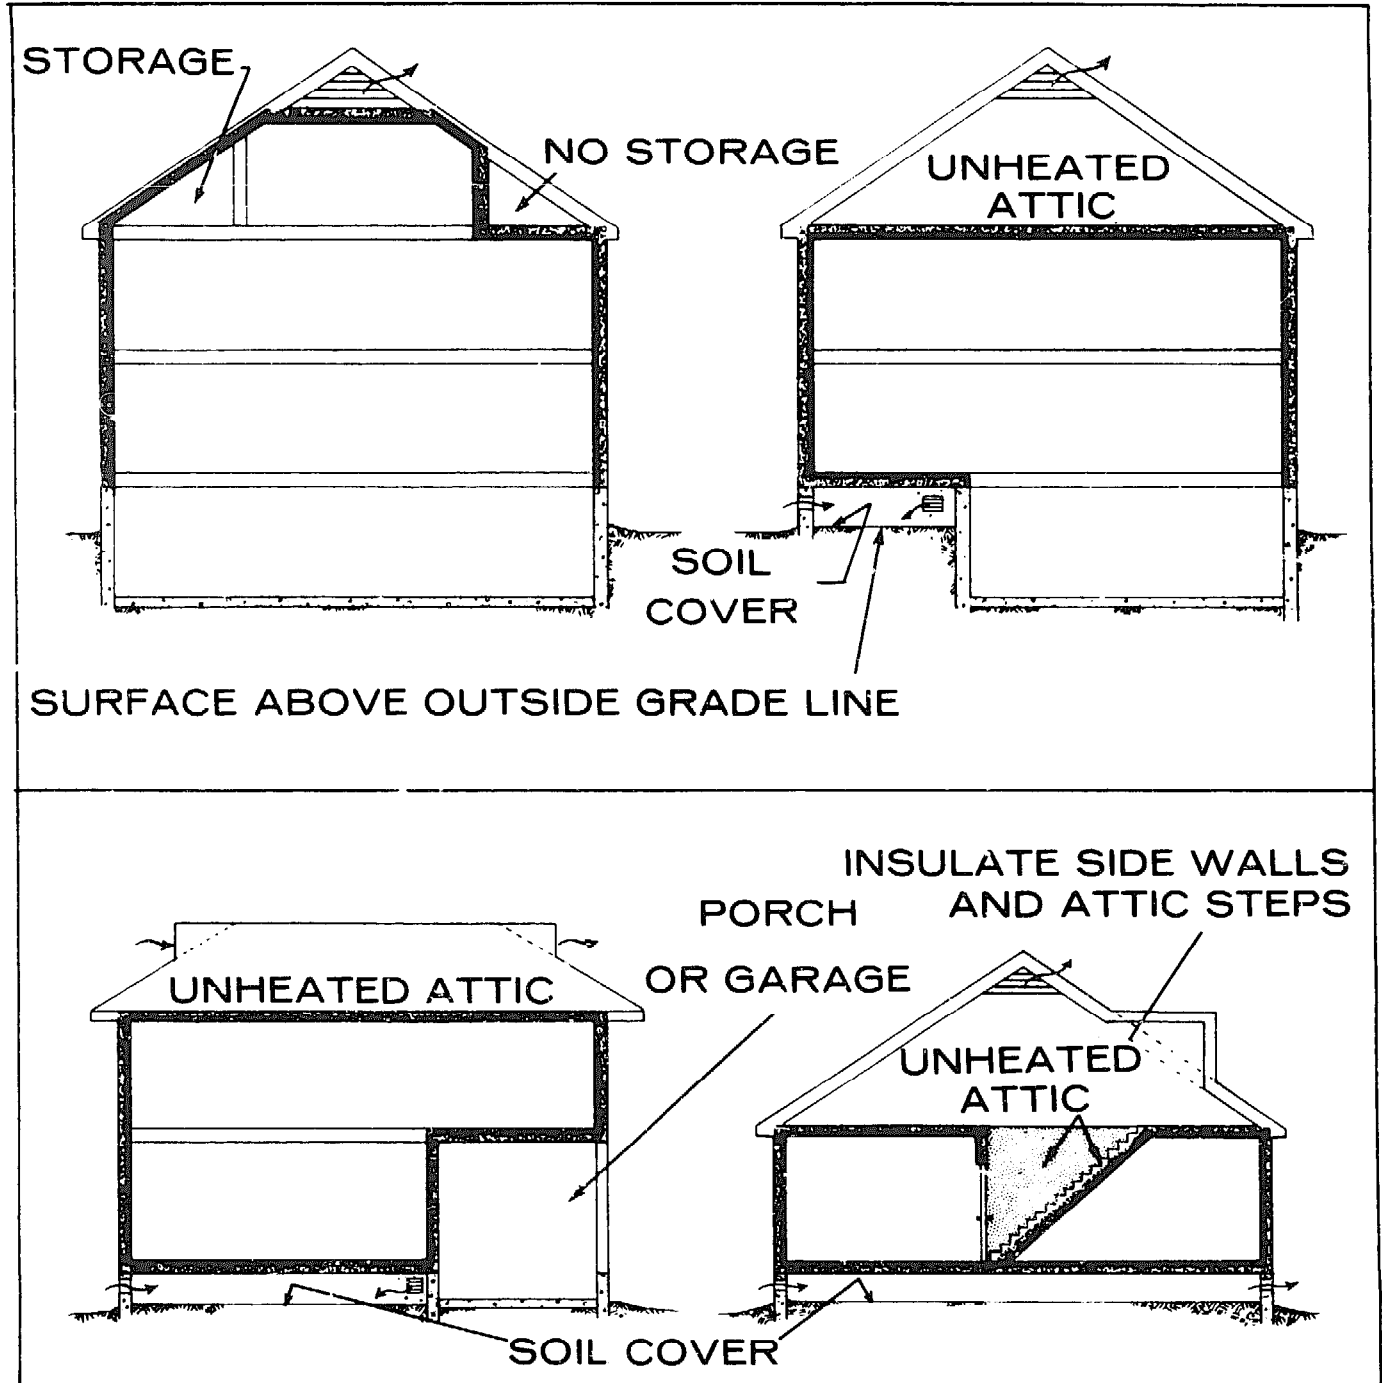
Insulation should be installed in side walls between heated rooms and outdoors, in walls and floors between unheated garages and porches and heated rooms, in floors in basementless houses, in ceilings below unheated attics, in roofs over heated rooms, and in side walls and below stairs leading to unheated attics.
